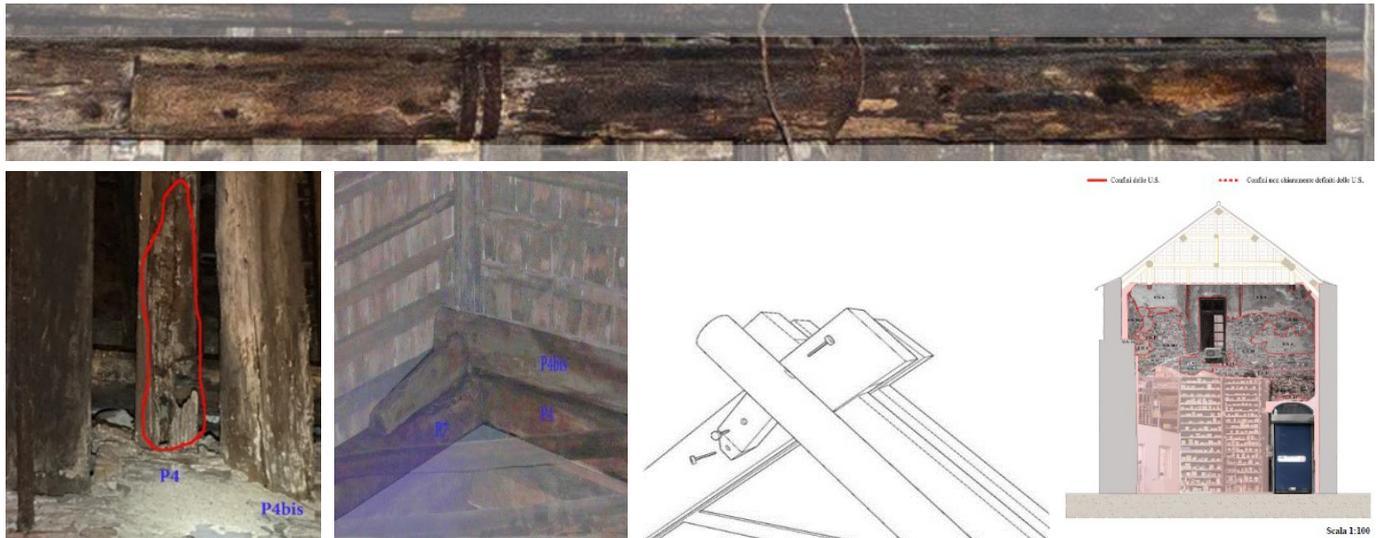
Parts of the roof showing interventions following construction [13, 16].
